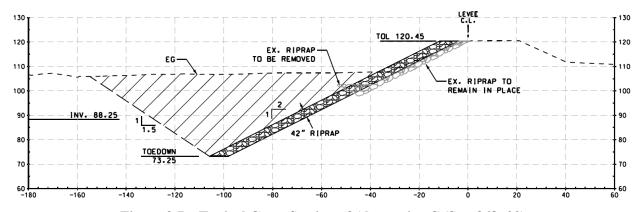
Typical Cross Section of Alternative C (Sta. 368+00)
